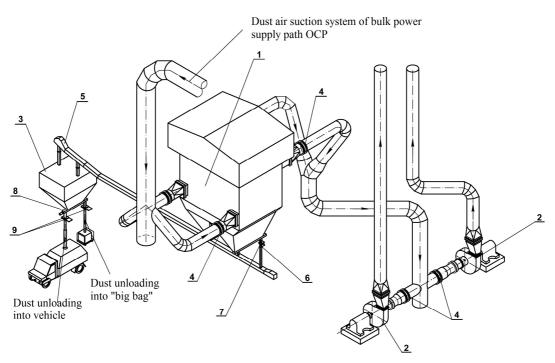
The scheme of centralized aspiration gas purification B-1: 1 – bag hoseFRIR-1100x2; 2 – exhauster DN-19MK; 3 – dust collecting hopper; 4 – valve Du1500; 5 – conveyor COW (2 M)-320; 6 – gateway feeder; 7 – disc valve; 8 – reversing screw feeder; 9 – plate gate
